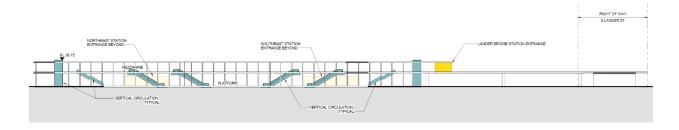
SODO Access to S Lander Street Station Plan (Platform Plan)
